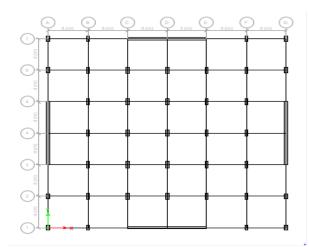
Model 2 (Building with rectangular shaped shear wall)
